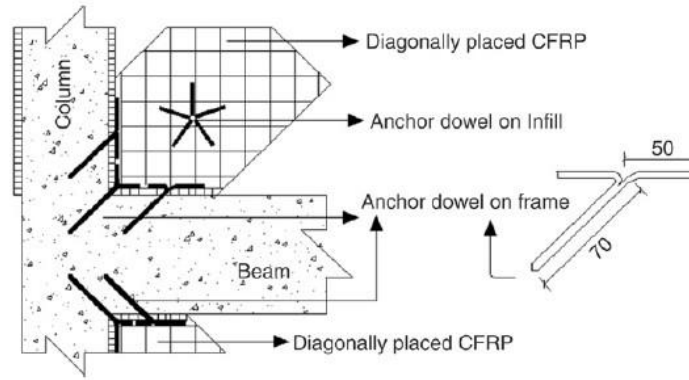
CFRP anchorage details [adapted from Erdem et al. (2006)].
